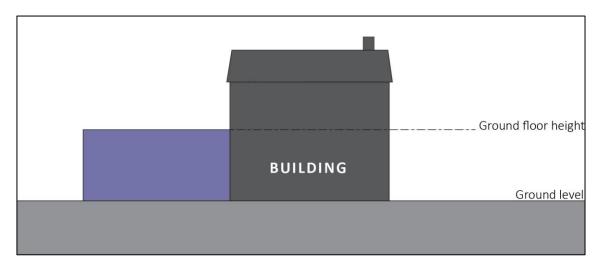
Construction of a single-storey addition or extension to an existing building is exempt if the walls of the addition do not exceed the ground floor height of the existing two-storey building; note this graphic does not indicate or specify the form of the roof to the addition
